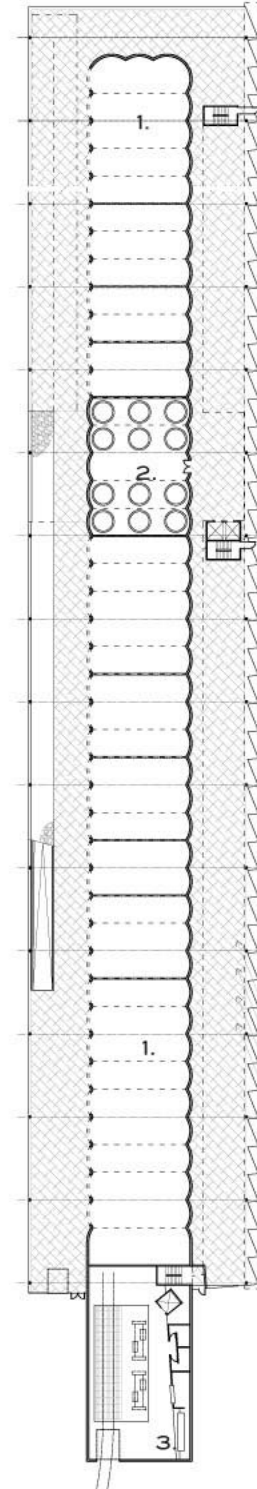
Ground floor plan prepared for the Central Glass Competition by author, 2006.
